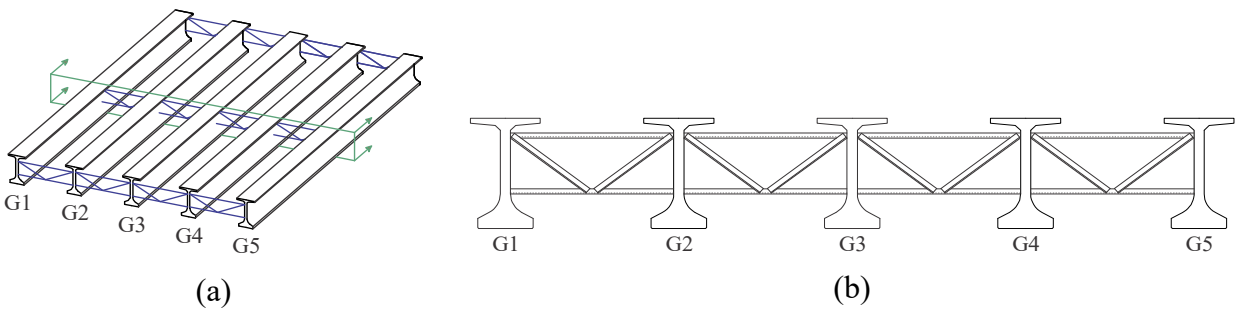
Bridge cross-section with interior midspan *steel* K-bracing: (a) Isometric view; (b) Cross-section at the midspan
